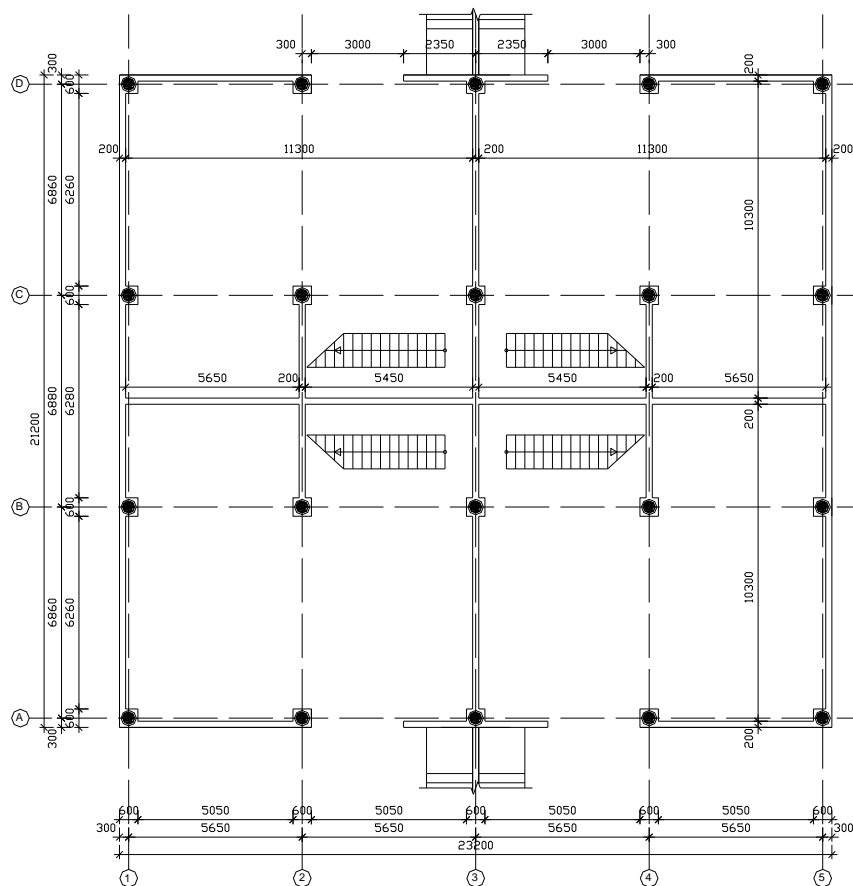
Plan of the lower pedestals and shear walls in the basement/parking floor of four residential houses, as well as plan of the SILRSBs located on lower pedestals
